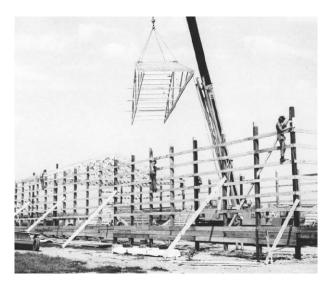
Poles provide economical foundation and wall systems for agricultural and storage buildings.
